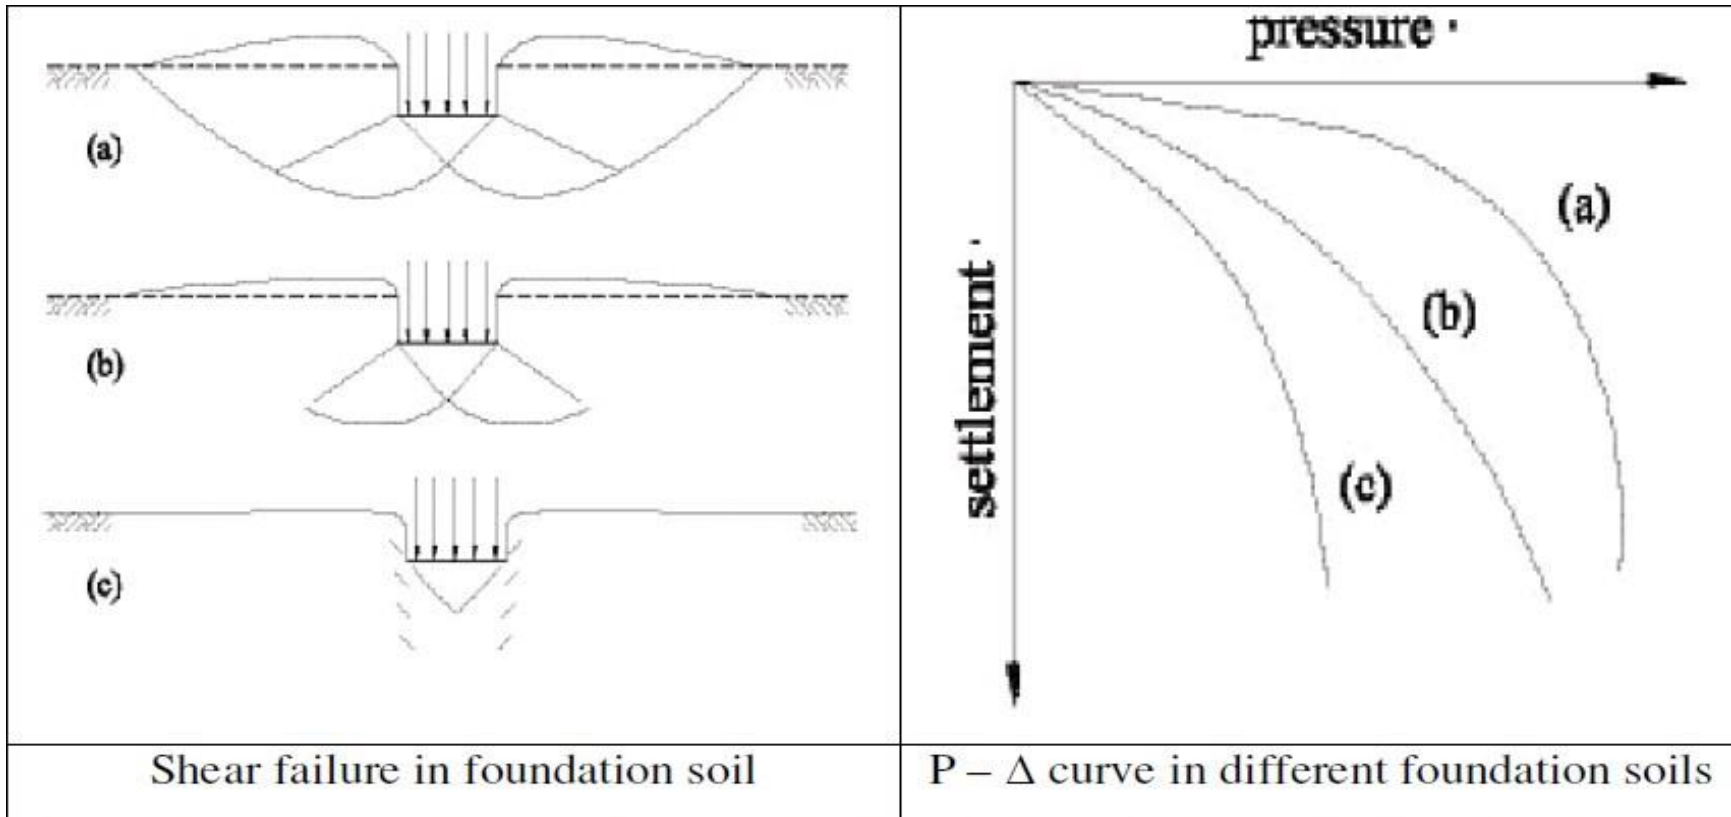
1 : Footing on ground that experiences a) General shear failure, b) Local shear failure and c) Punching shear failure
